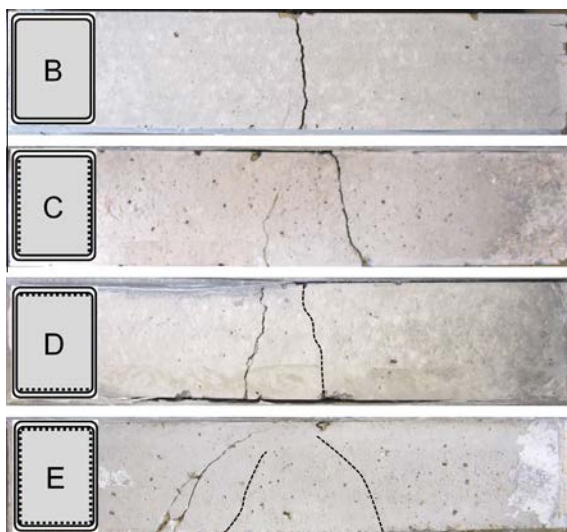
Typical concrete cracking patterns for short beam configurations.
